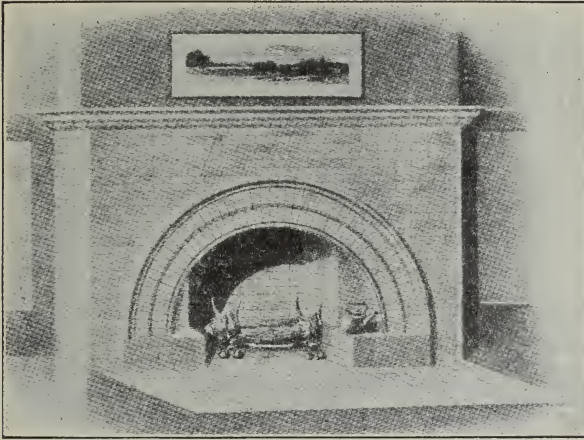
Design for Brick Mantel. Gladding, McBean & Co., San Francisco.
